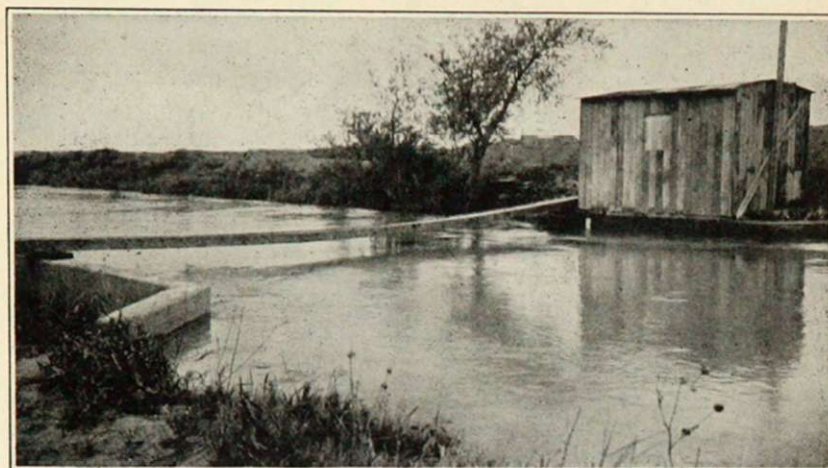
Old concrete rating flume and gage house on Holbrook Canal, typical of many old structures replaced by Parshall Measuring Flumes.
